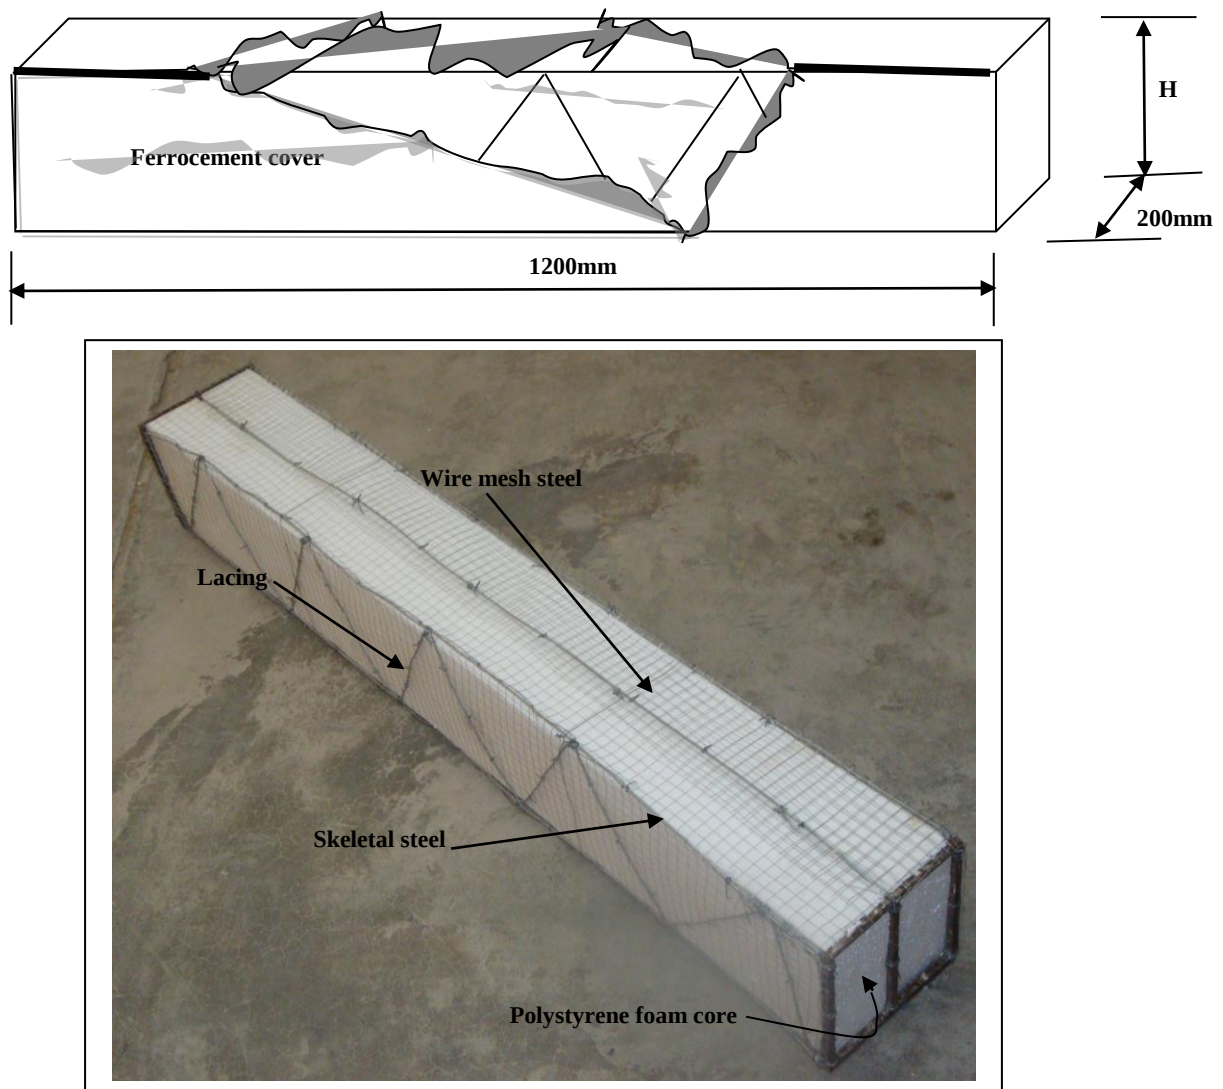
Geometry and reinforcement details of Monopanel beam specimens used for groups A,B and C
